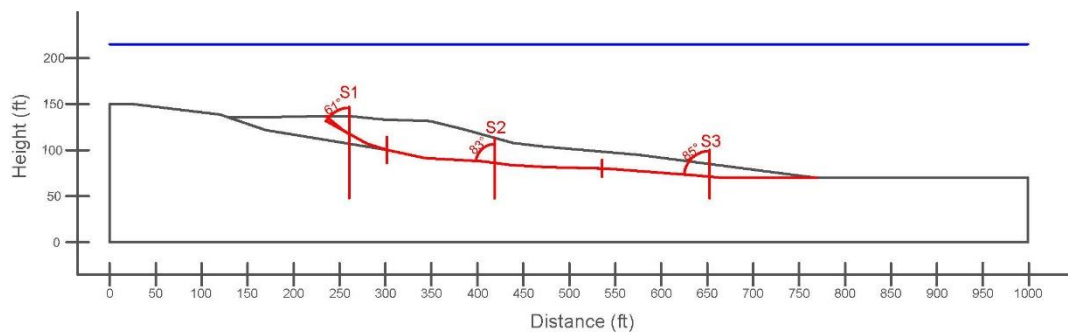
Sub-sectioning of the cross-section and failure plane for Nerlerk Embankment Slide 1
